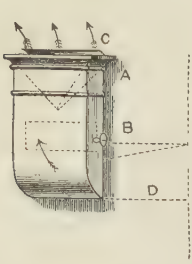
Wall Bracket Inlet on Tobin's System.
